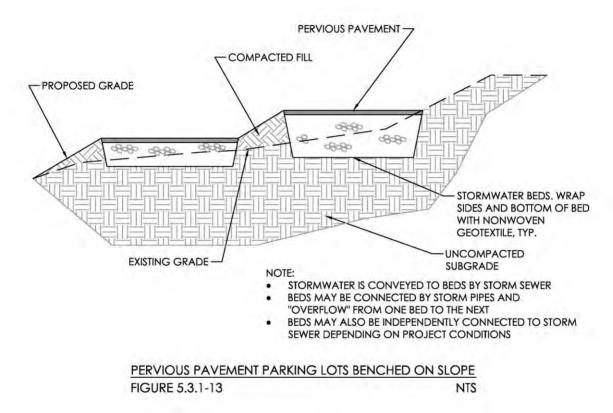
Pervious pavement beds can be terraced on a slope to provide level infiltration bed bottoms and to reduce the pavement slope.
